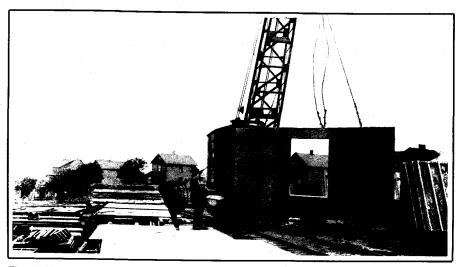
Handling wall slabs. Note that a locomotive crane on a standard railroad track handled cast units.
